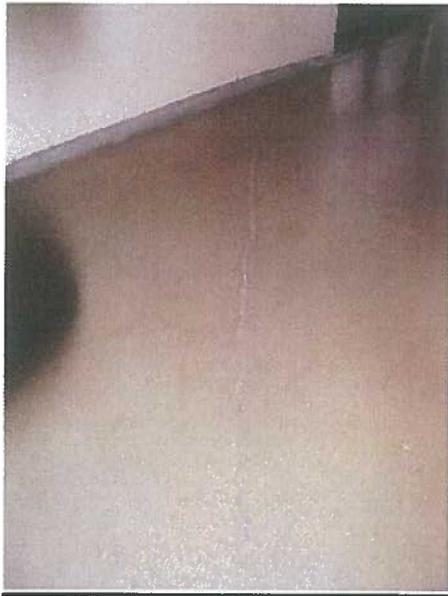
The photo above shows one of the many cracks in the first floor concrete slab on-grade. It is located in one of the stair towers where cracks of this type were prevalent.
